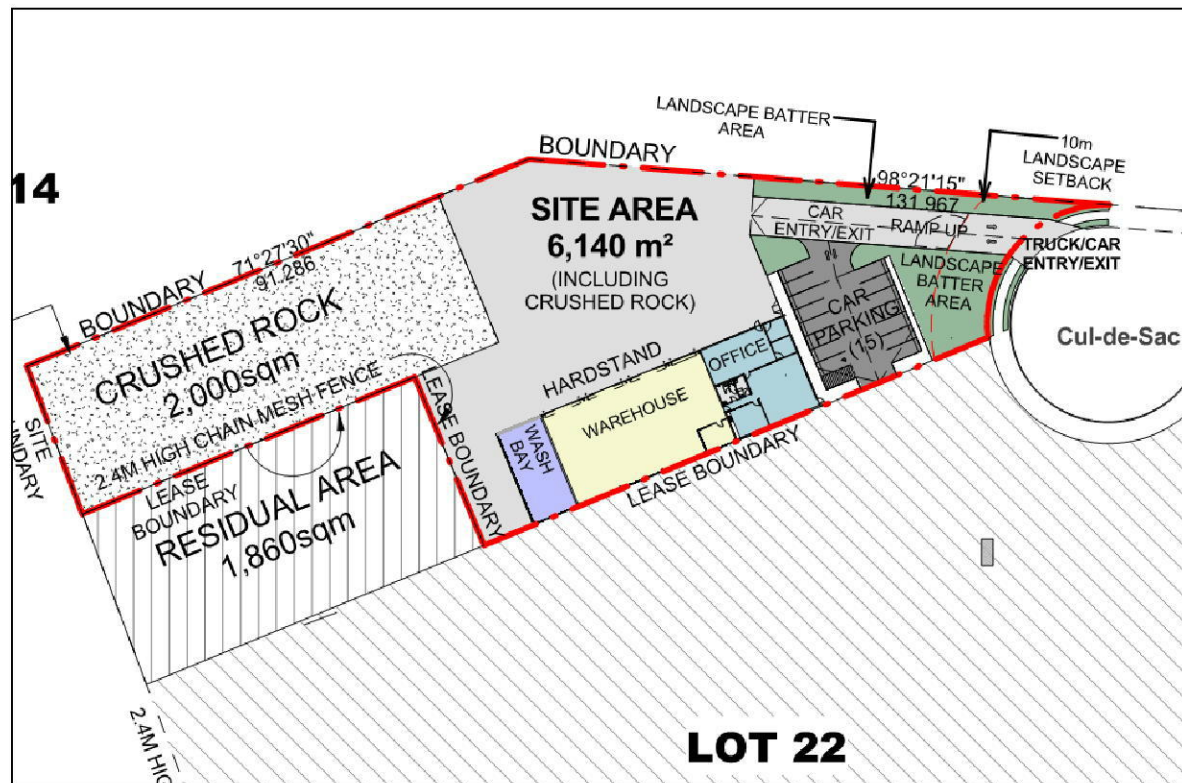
Proposed Site Plan (Reid Campbell, 2016)
